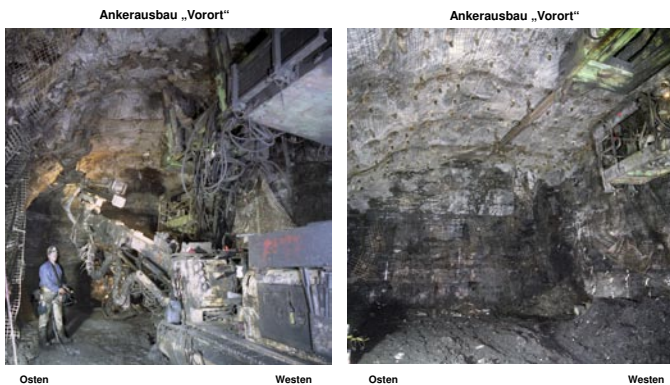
Advance drive (roadhead bolting with a bolt setting platform and twin-boom drill jumbo)
